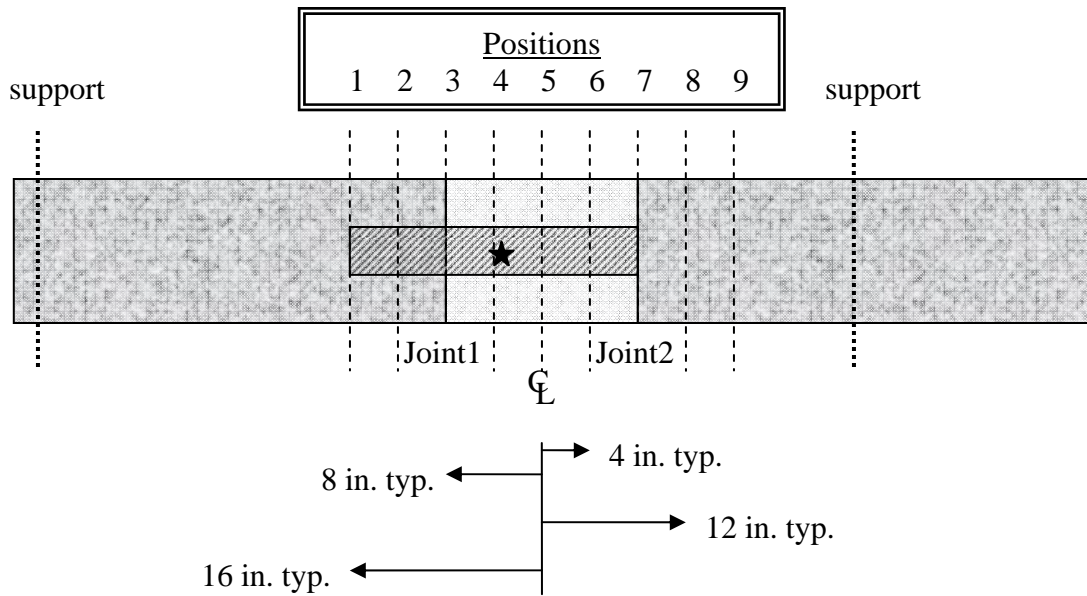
Type 1 and Type 2 position labels for concrete strain gages
